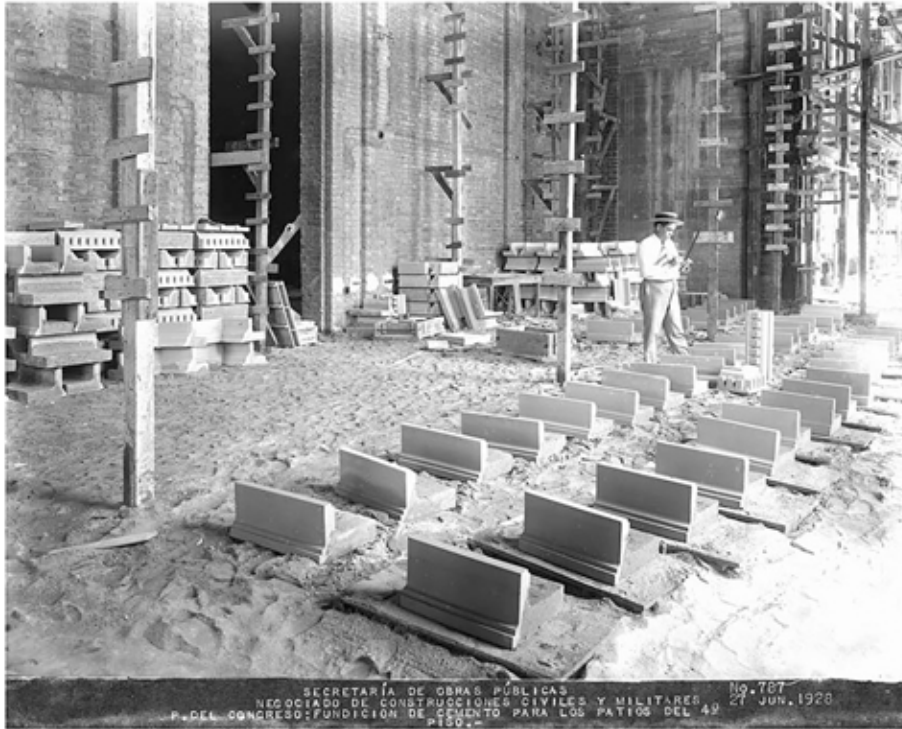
Concrete casting workshop for the 4th floor courtyards, on site. Source: Archivo Secretaría de Obras Públicas. Negociado de Construcciones Civiles y Militares (Archive of Public Works Secretariat. Bureau of Civil and Military Constructions), 1928
